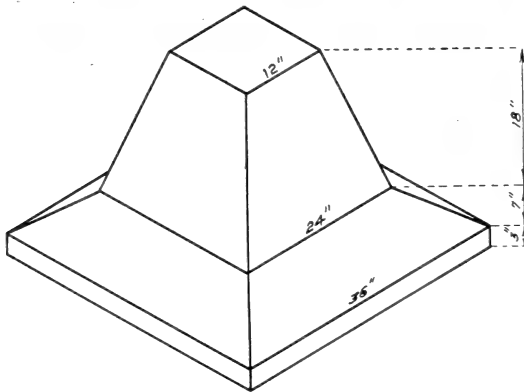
Sketch of a concrete foundation pier in use in a mill yard in Mississippi. It is cast in two sections, for convenience in aligning and moving about the yard.
